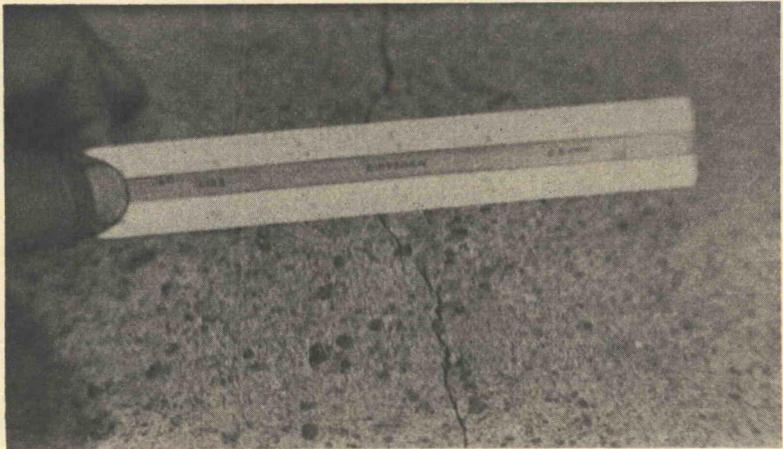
Typical cracking of mesh reinforced concrete pavement. S.T.H. 13, Clark and Taylor Counties, Wisconsin. (All cracks in reinforced sections were extremely narrow)
